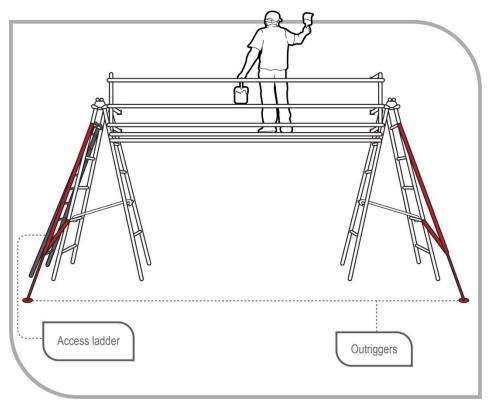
Trestle ladder scaffold with guard rails and outriggers for stability
